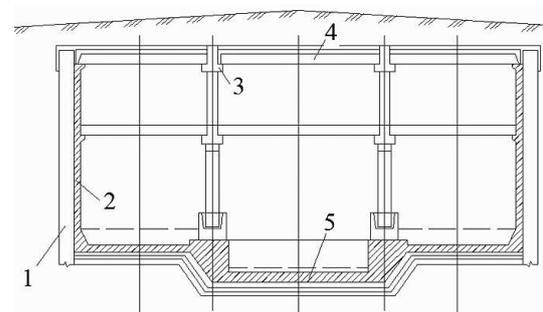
Design of an underground vestibule of a shallow-depth station: 1 – “a slurry wall”; 2 – a load-bearing wall with a crossbar for fastening the floor; 3 – span for fastening the floor; 4 – floor; 5 – trough part made of monolithic concrete
